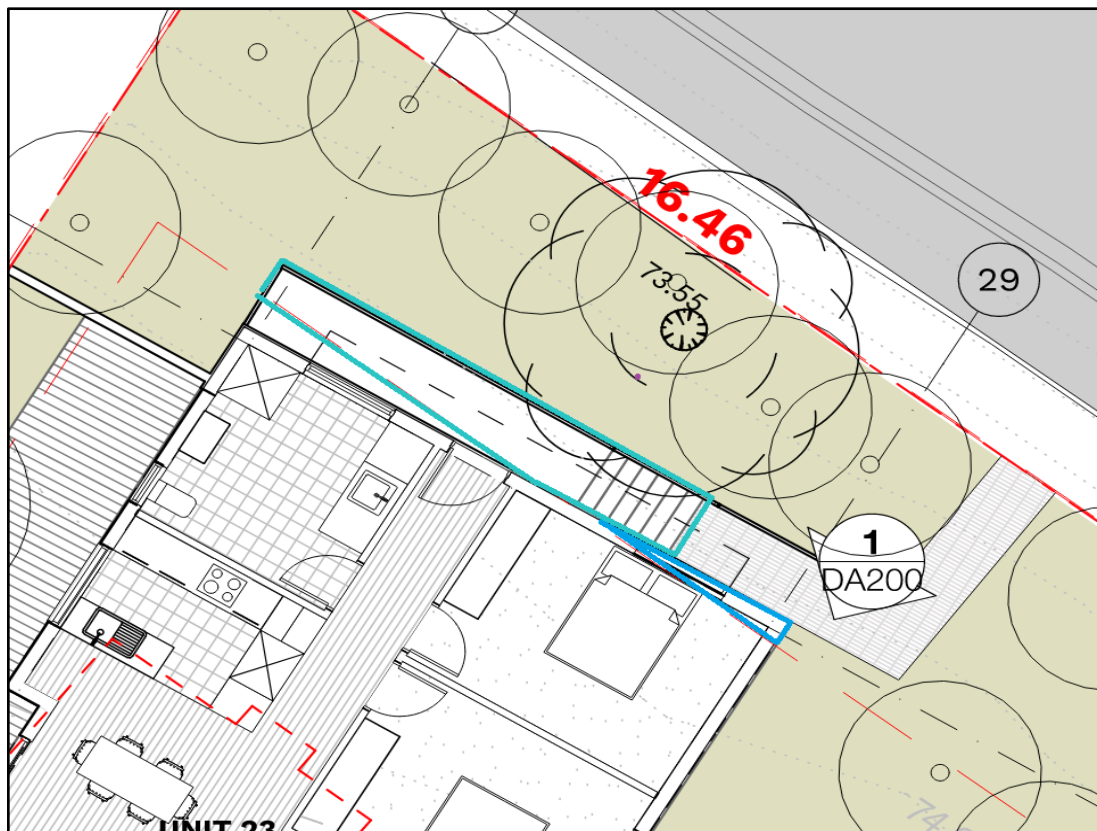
Extent of protrusion into the frontage setback where blue is the façade of the building and teal is the stair and balustrade.
